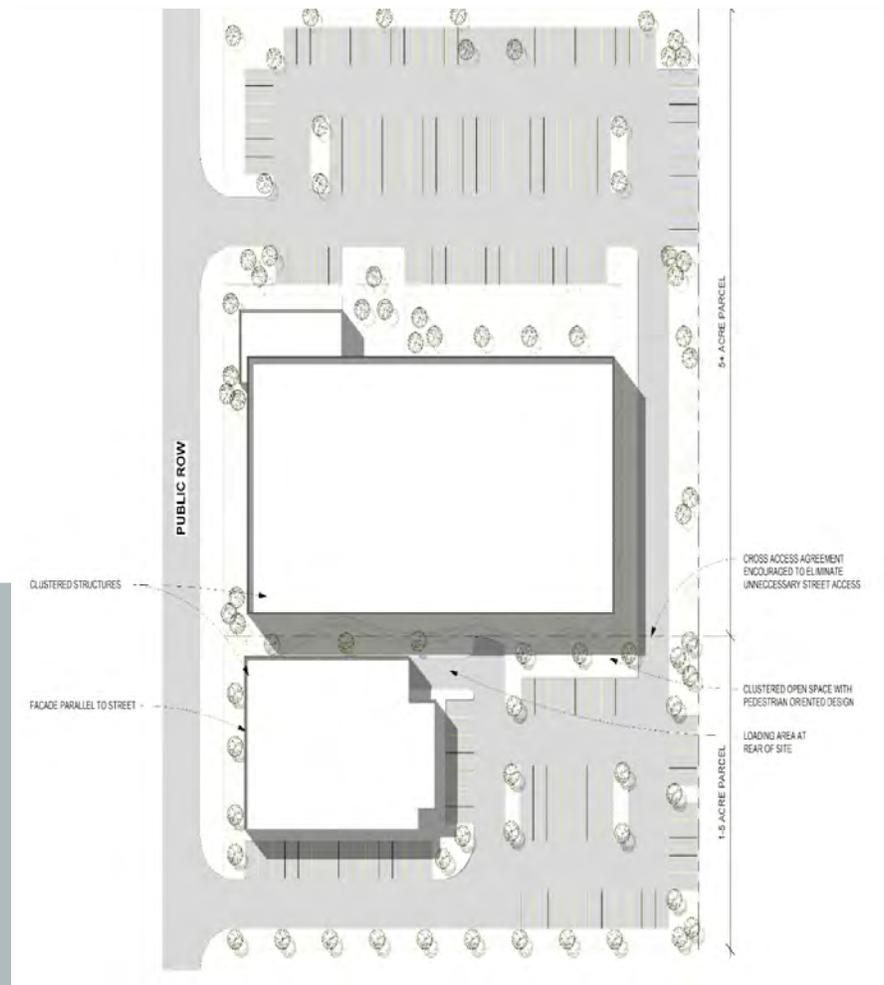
Site plan depicting potential new development within the RRD or Entrance Corridor no. 4
